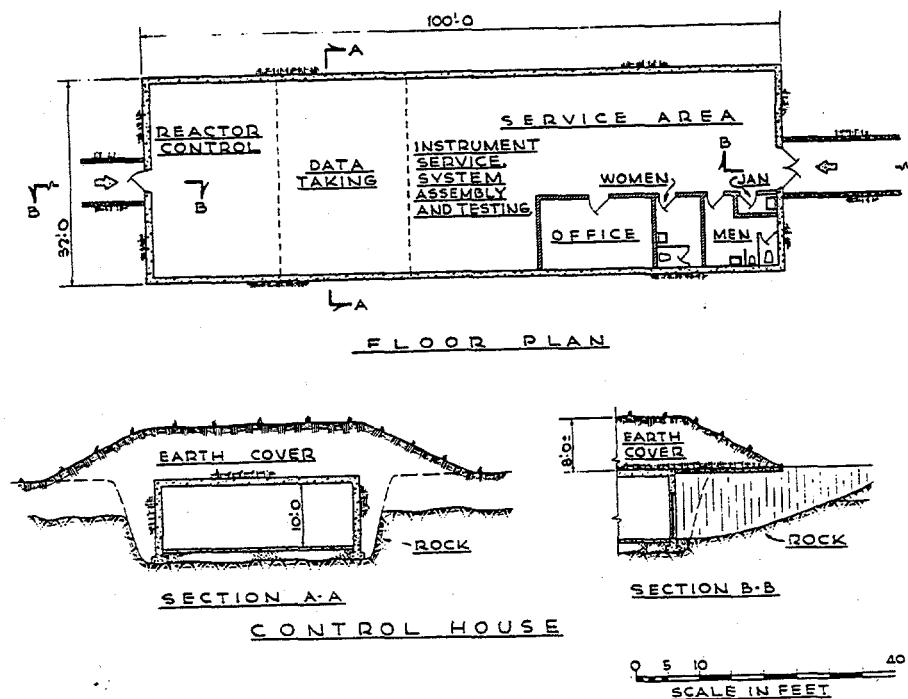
Underground Control House for Tower Shielding Reactor.
